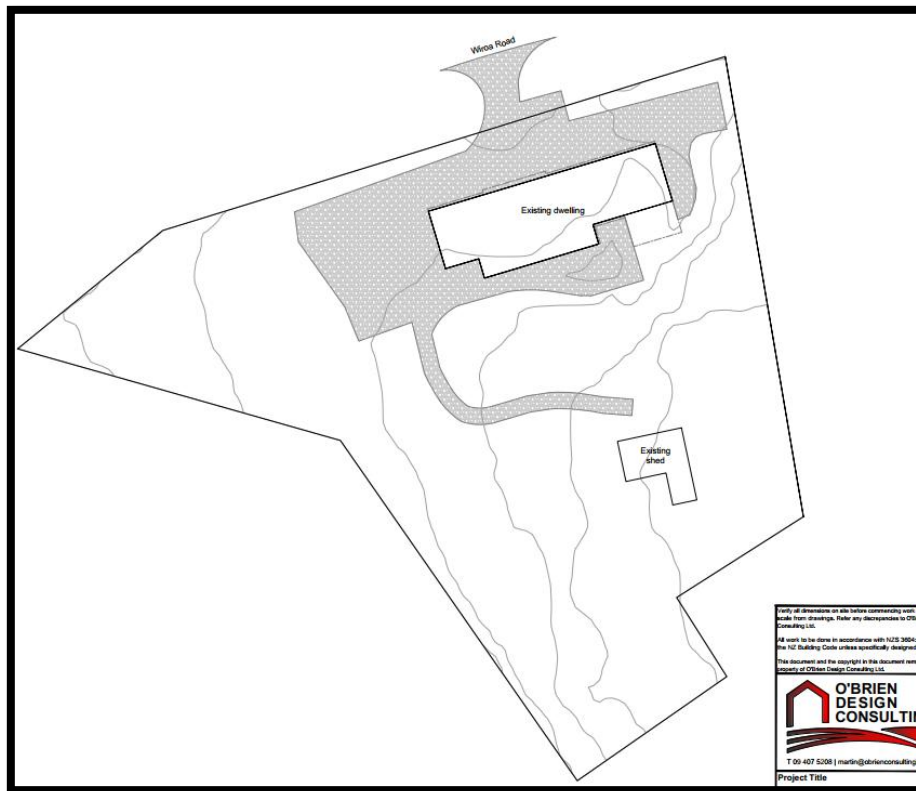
Site Plan showing approx. location of converted dwelling to Wiroa Road and shed on site
